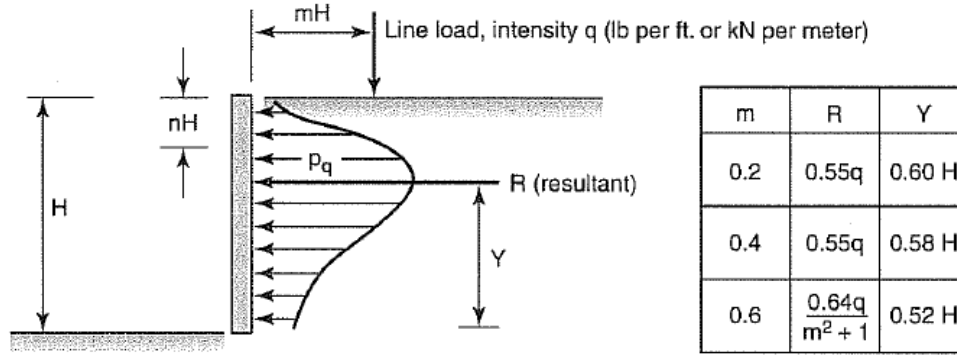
Pressure distribution against vertical wall resulting from line load of intensity q .
